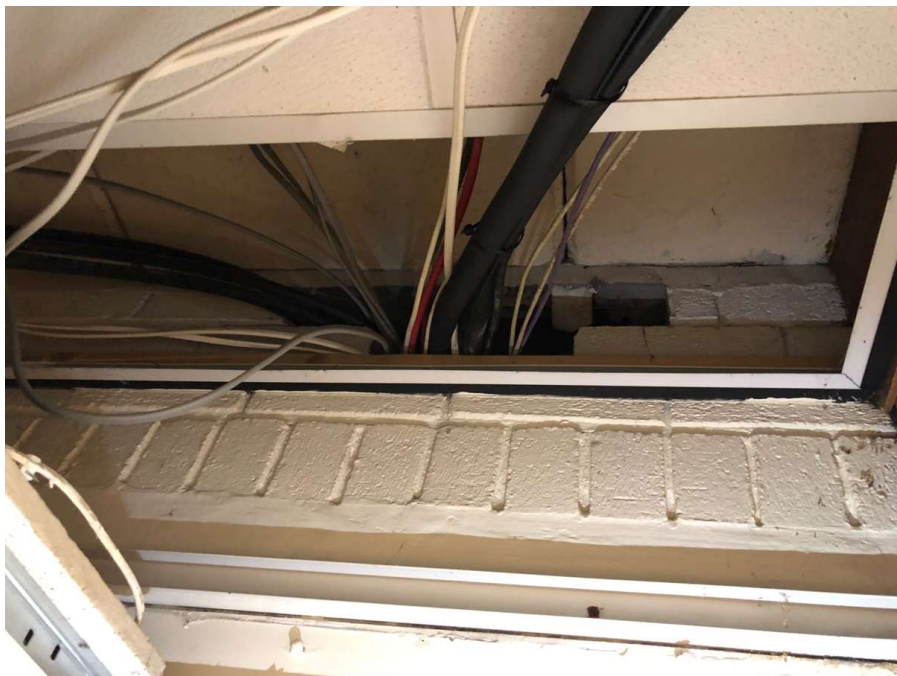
Lack of support to RAAC roof panel above corridor caused when service penetrations were made through the brickwork wall at high level. Urgent remedial is work required to reinstate adequate support and prevent failure of the panel.
